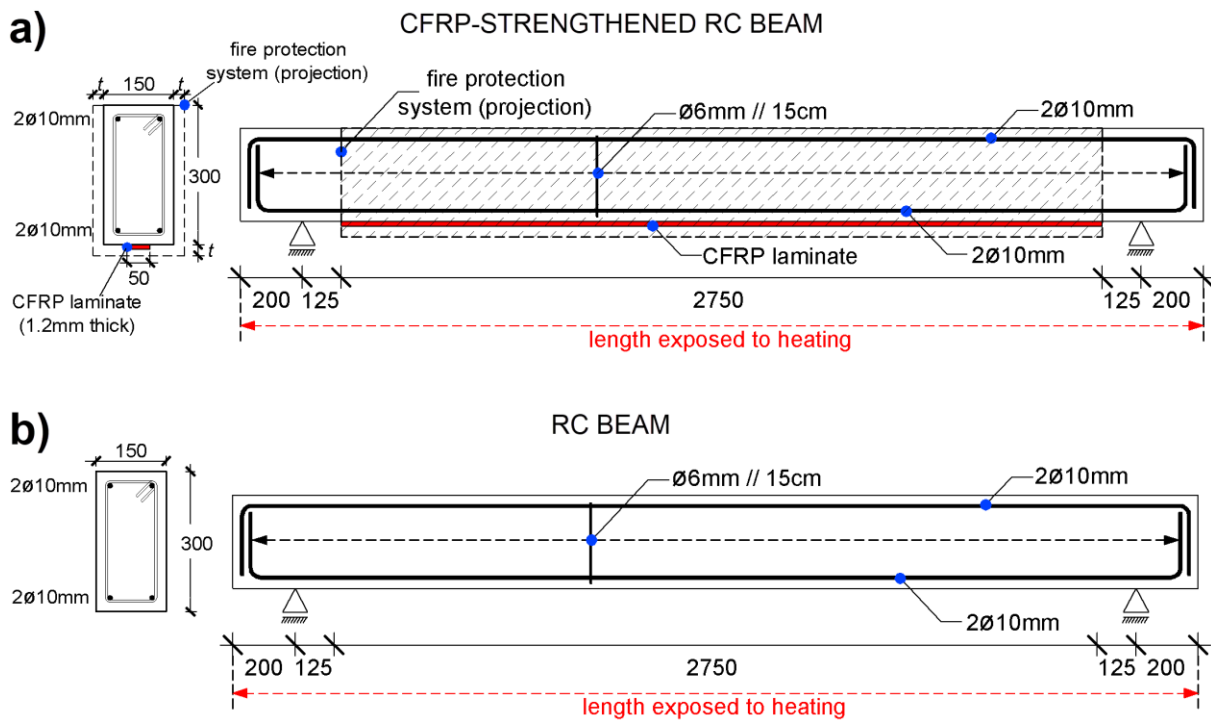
Geometry of the tested (a) CFRP-strengthened and (b) RC beams (not to scale, dimensions in mm)
